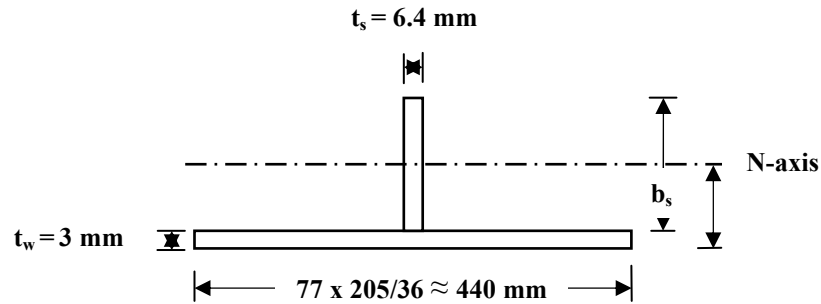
Required cross-section of intermediate GFRP stiffener for specimen B5
